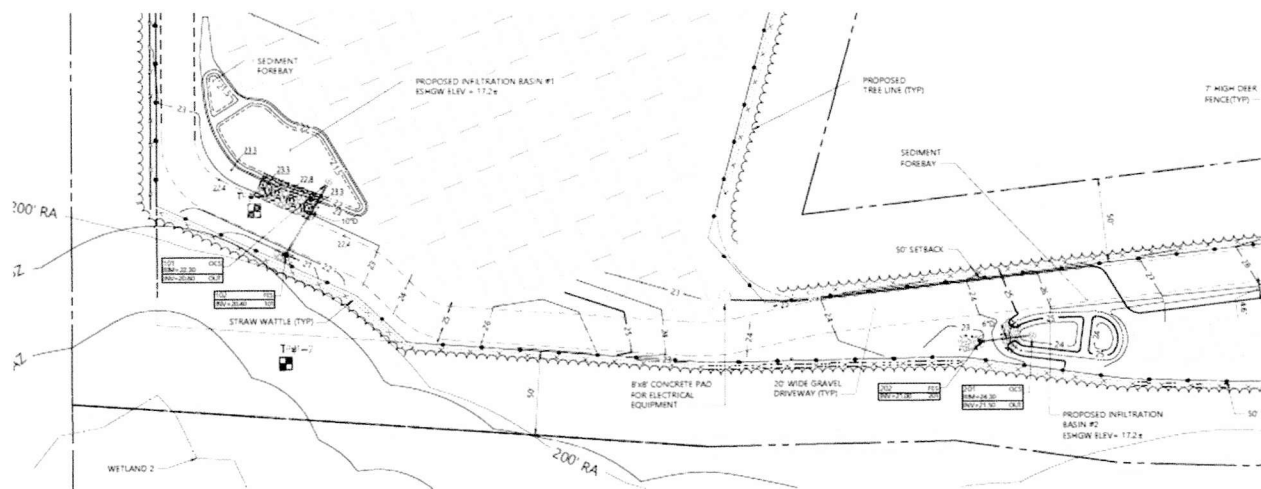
Site Plan Showing Proposed Stormwater Infiltration Basins and Test Pit Locations (Source, VHB, August 2, 2021)
